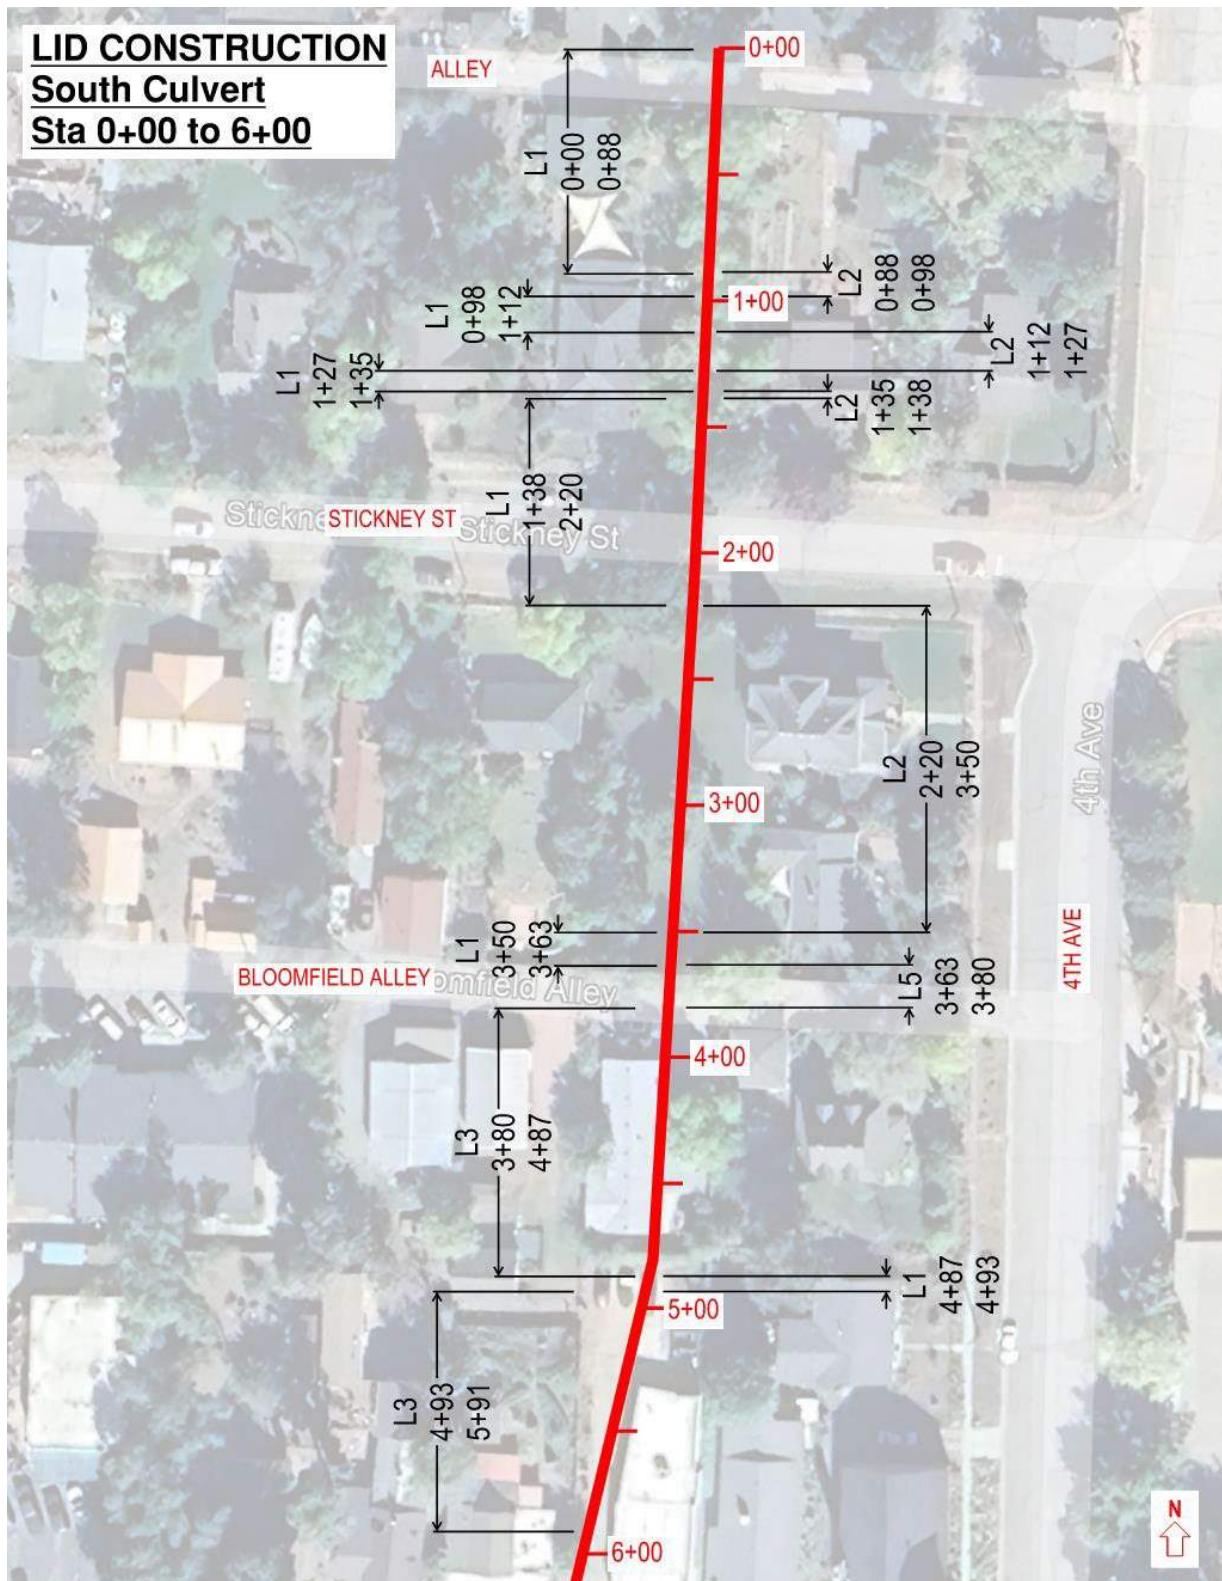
South Culvert Lid Construction Stations (S)0+00 to (S)6+00
